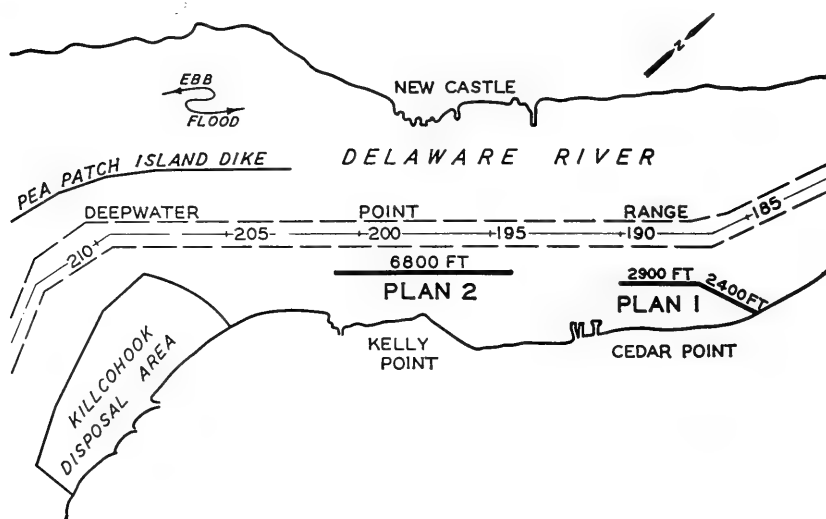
Location of plans 1 and 2, Deepwater Point Range.
